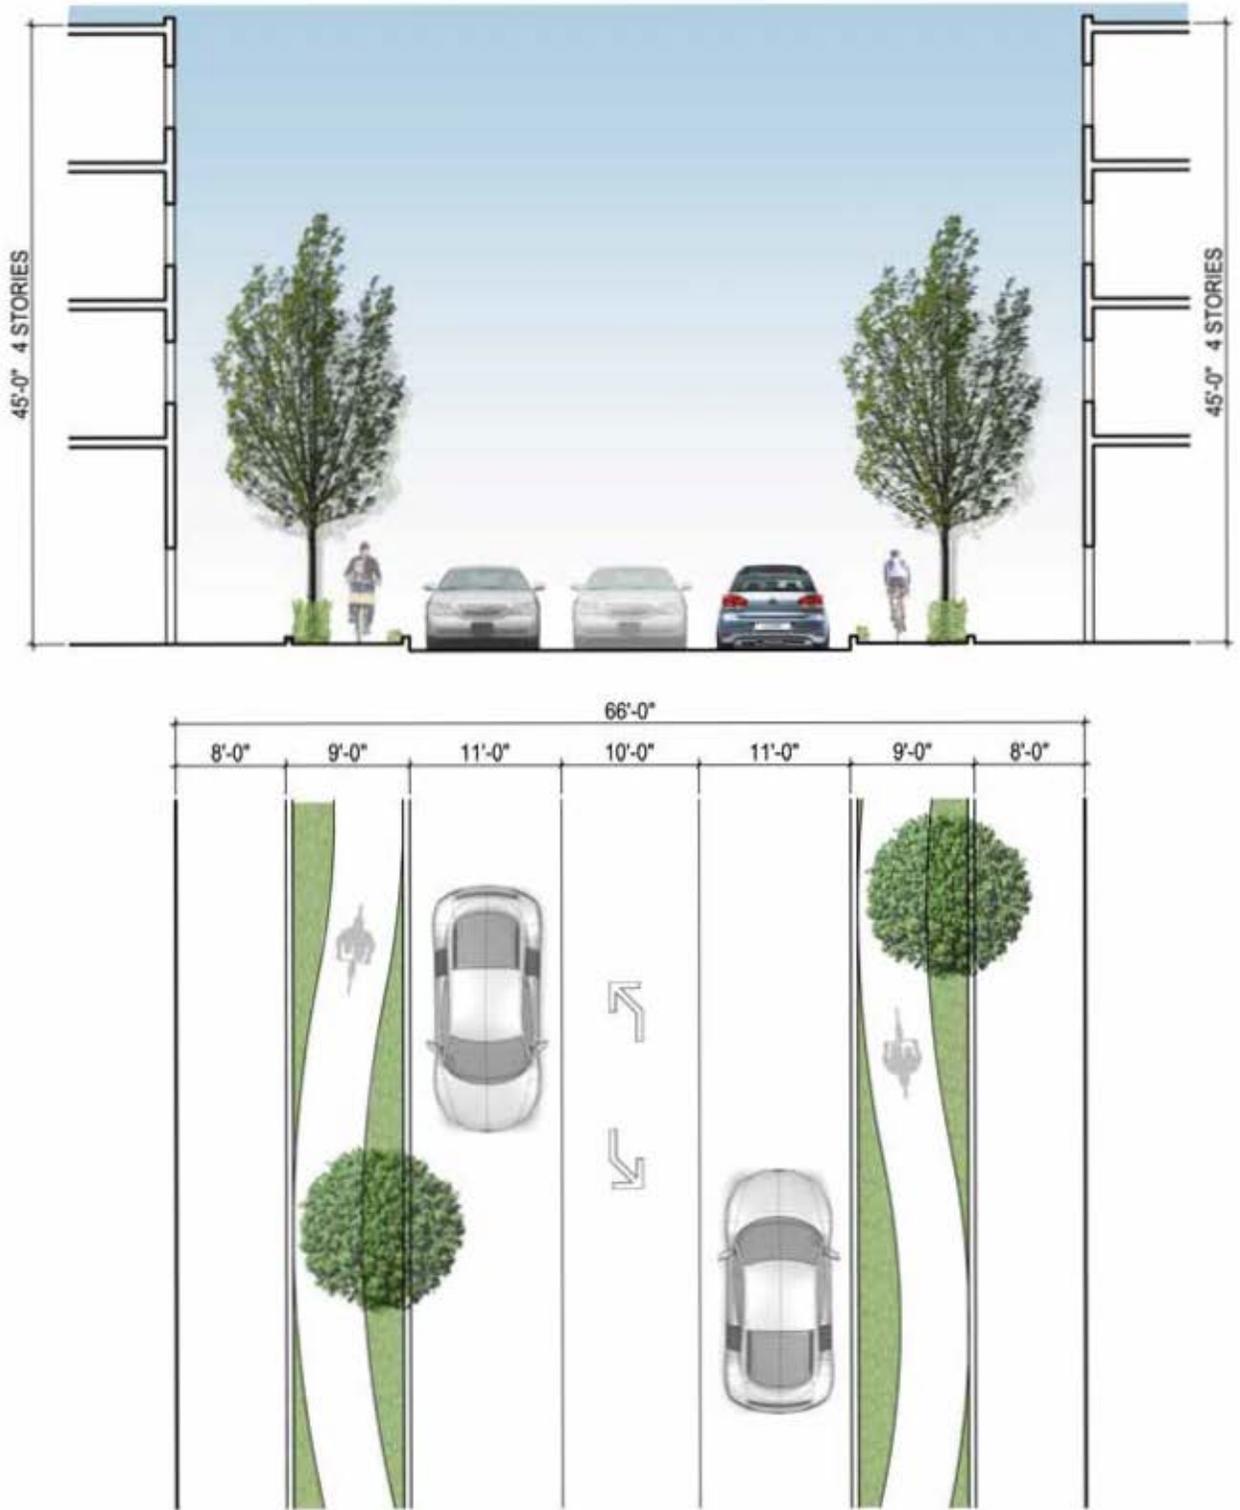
Street Plan and Section - LIRR to Hallock Ave with bicycle lane in planting strip
